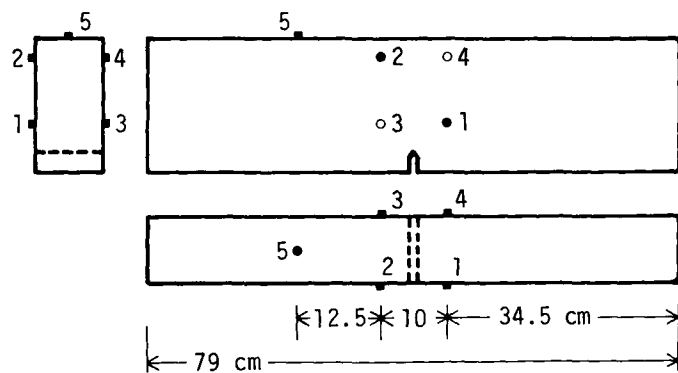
Position of Pick-ups on Beam AE-3.
